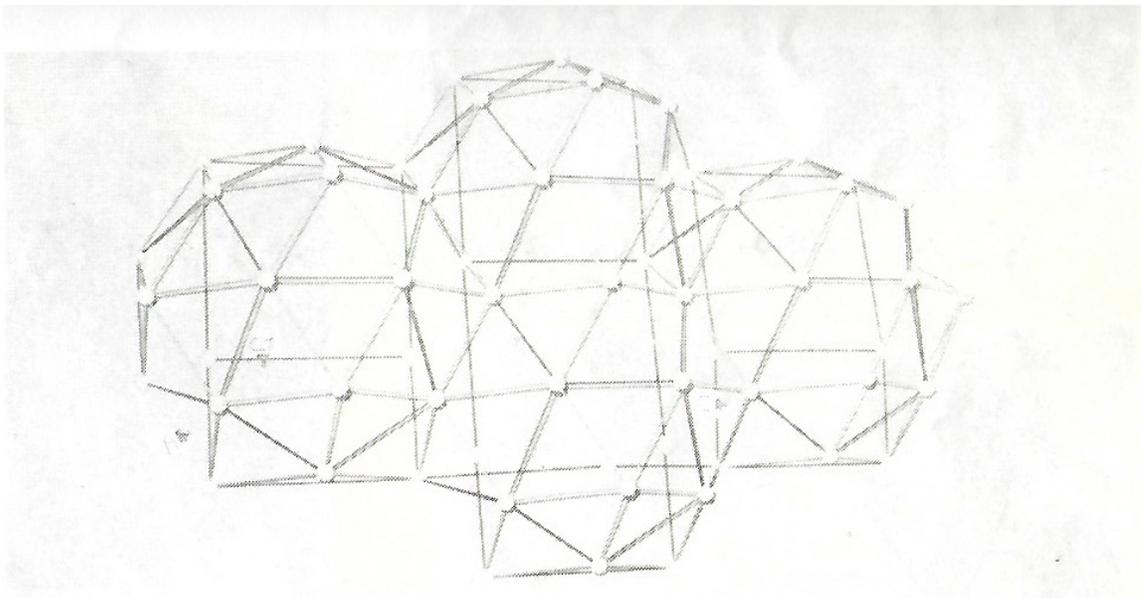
Fourth zone added - fused to two side zones through skew hexagon - fused to front zone through vertical section.
